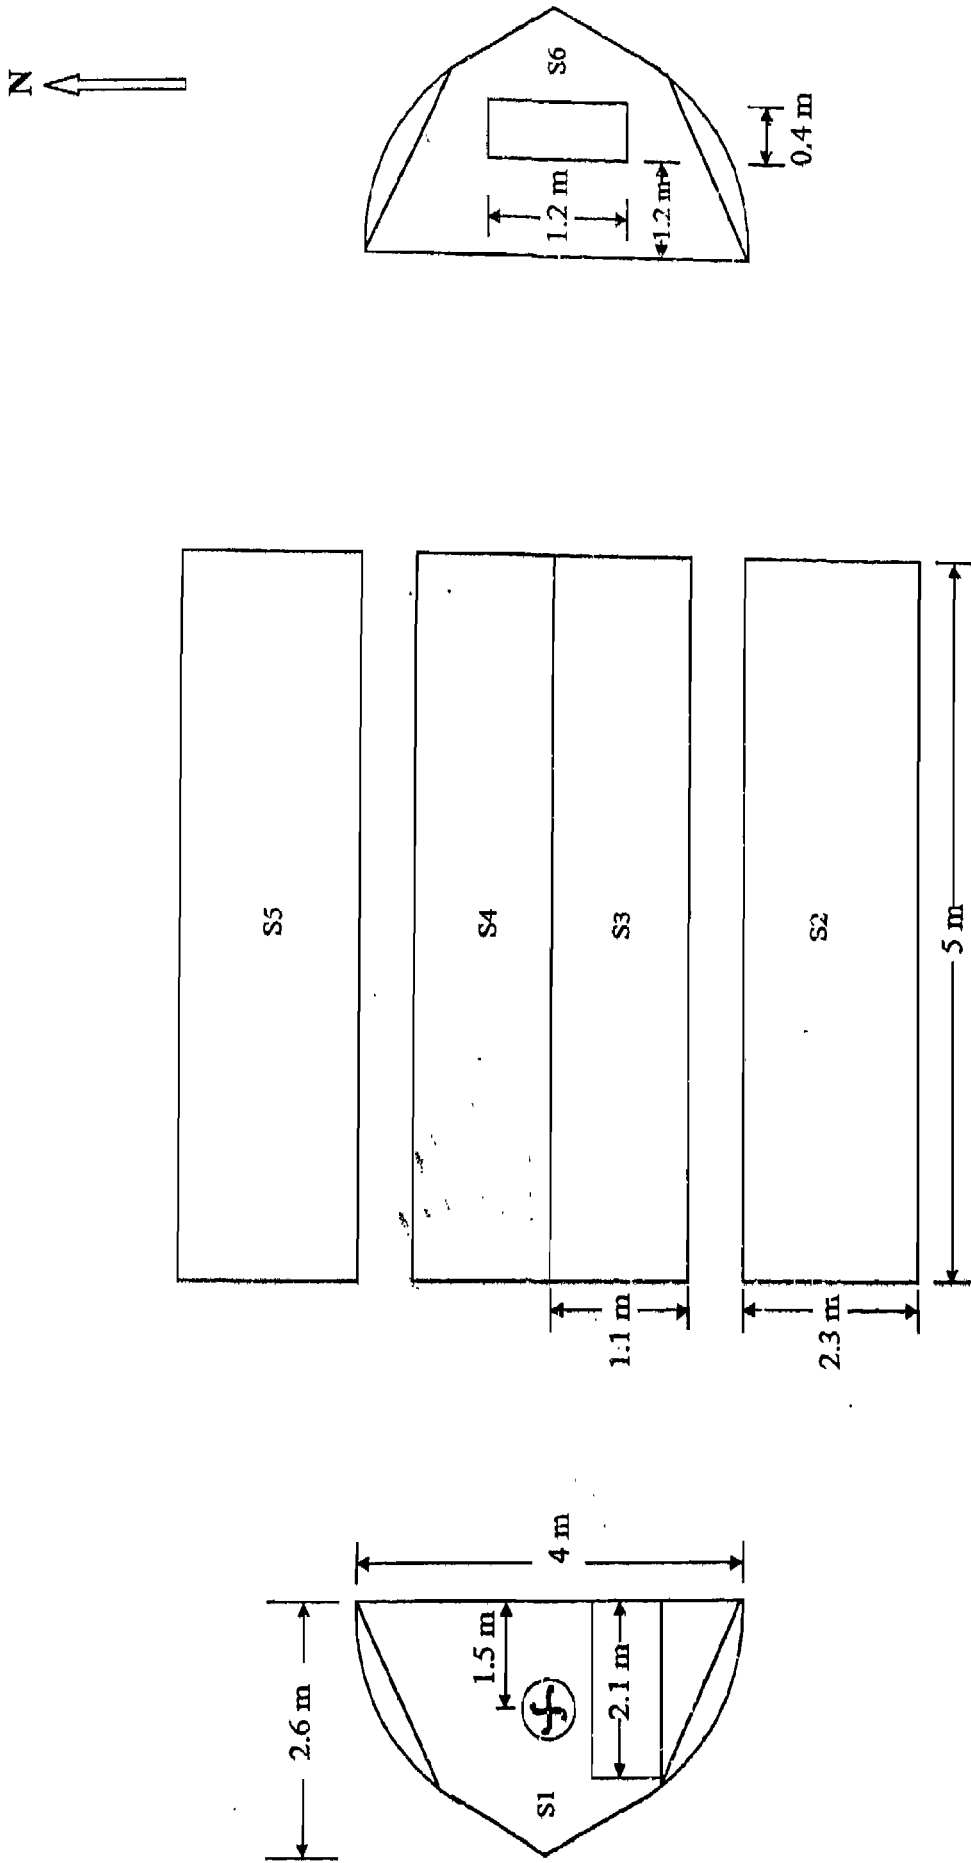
DETAILS OF TEST GREENHOUSE
